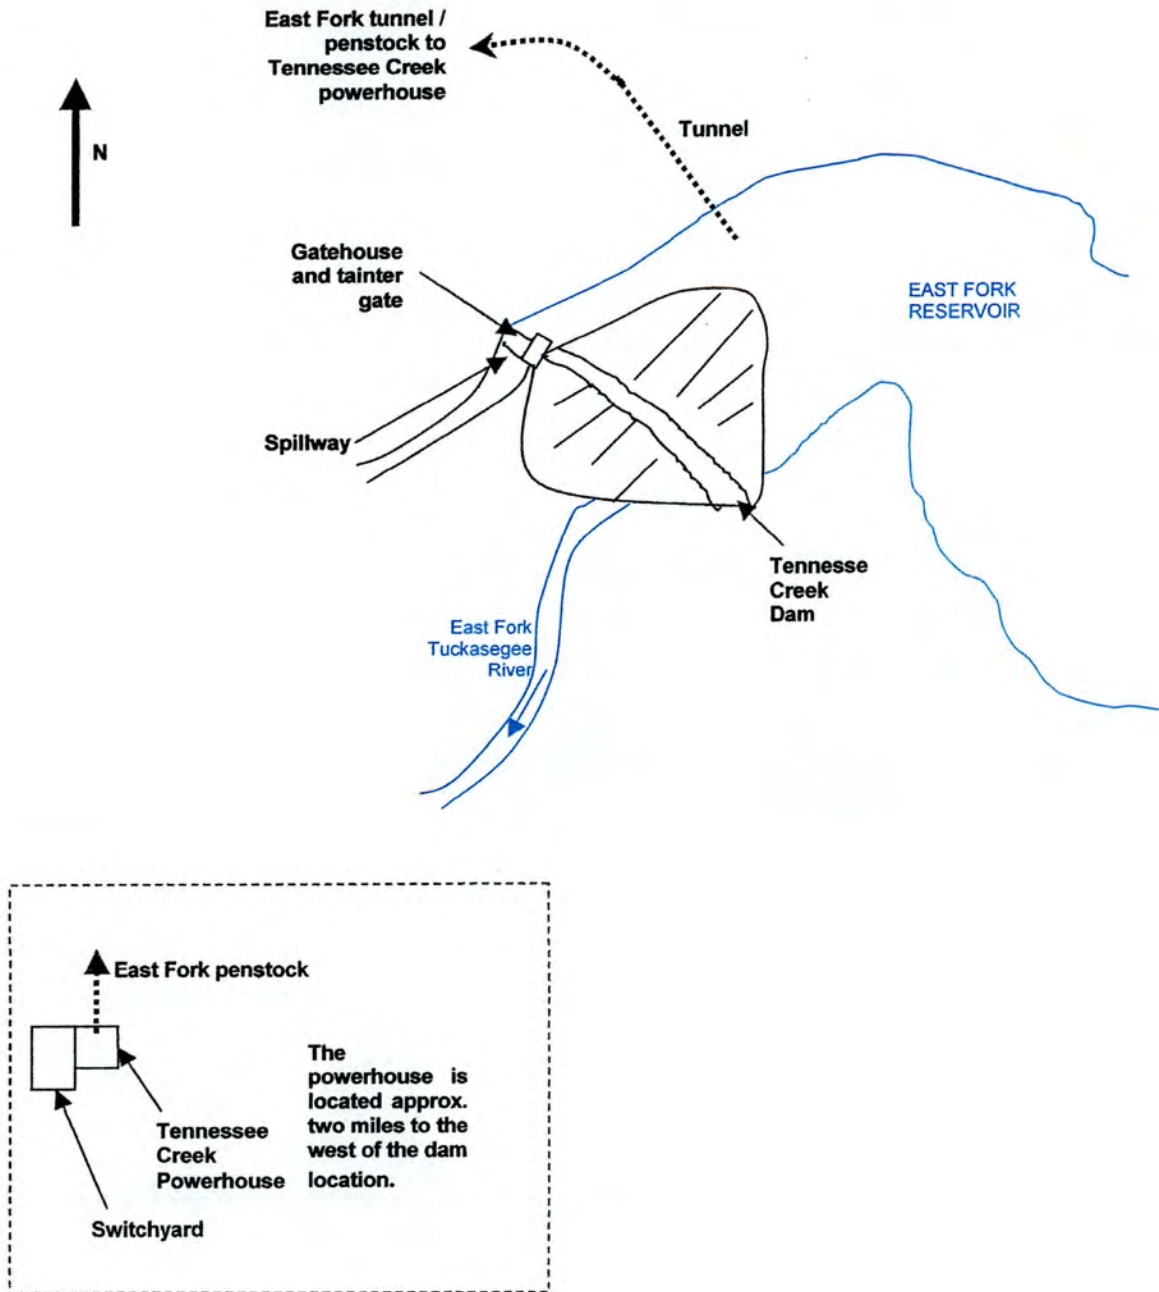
East Fork Dam and Tennessee Creek Powerhouse Site Plan.
